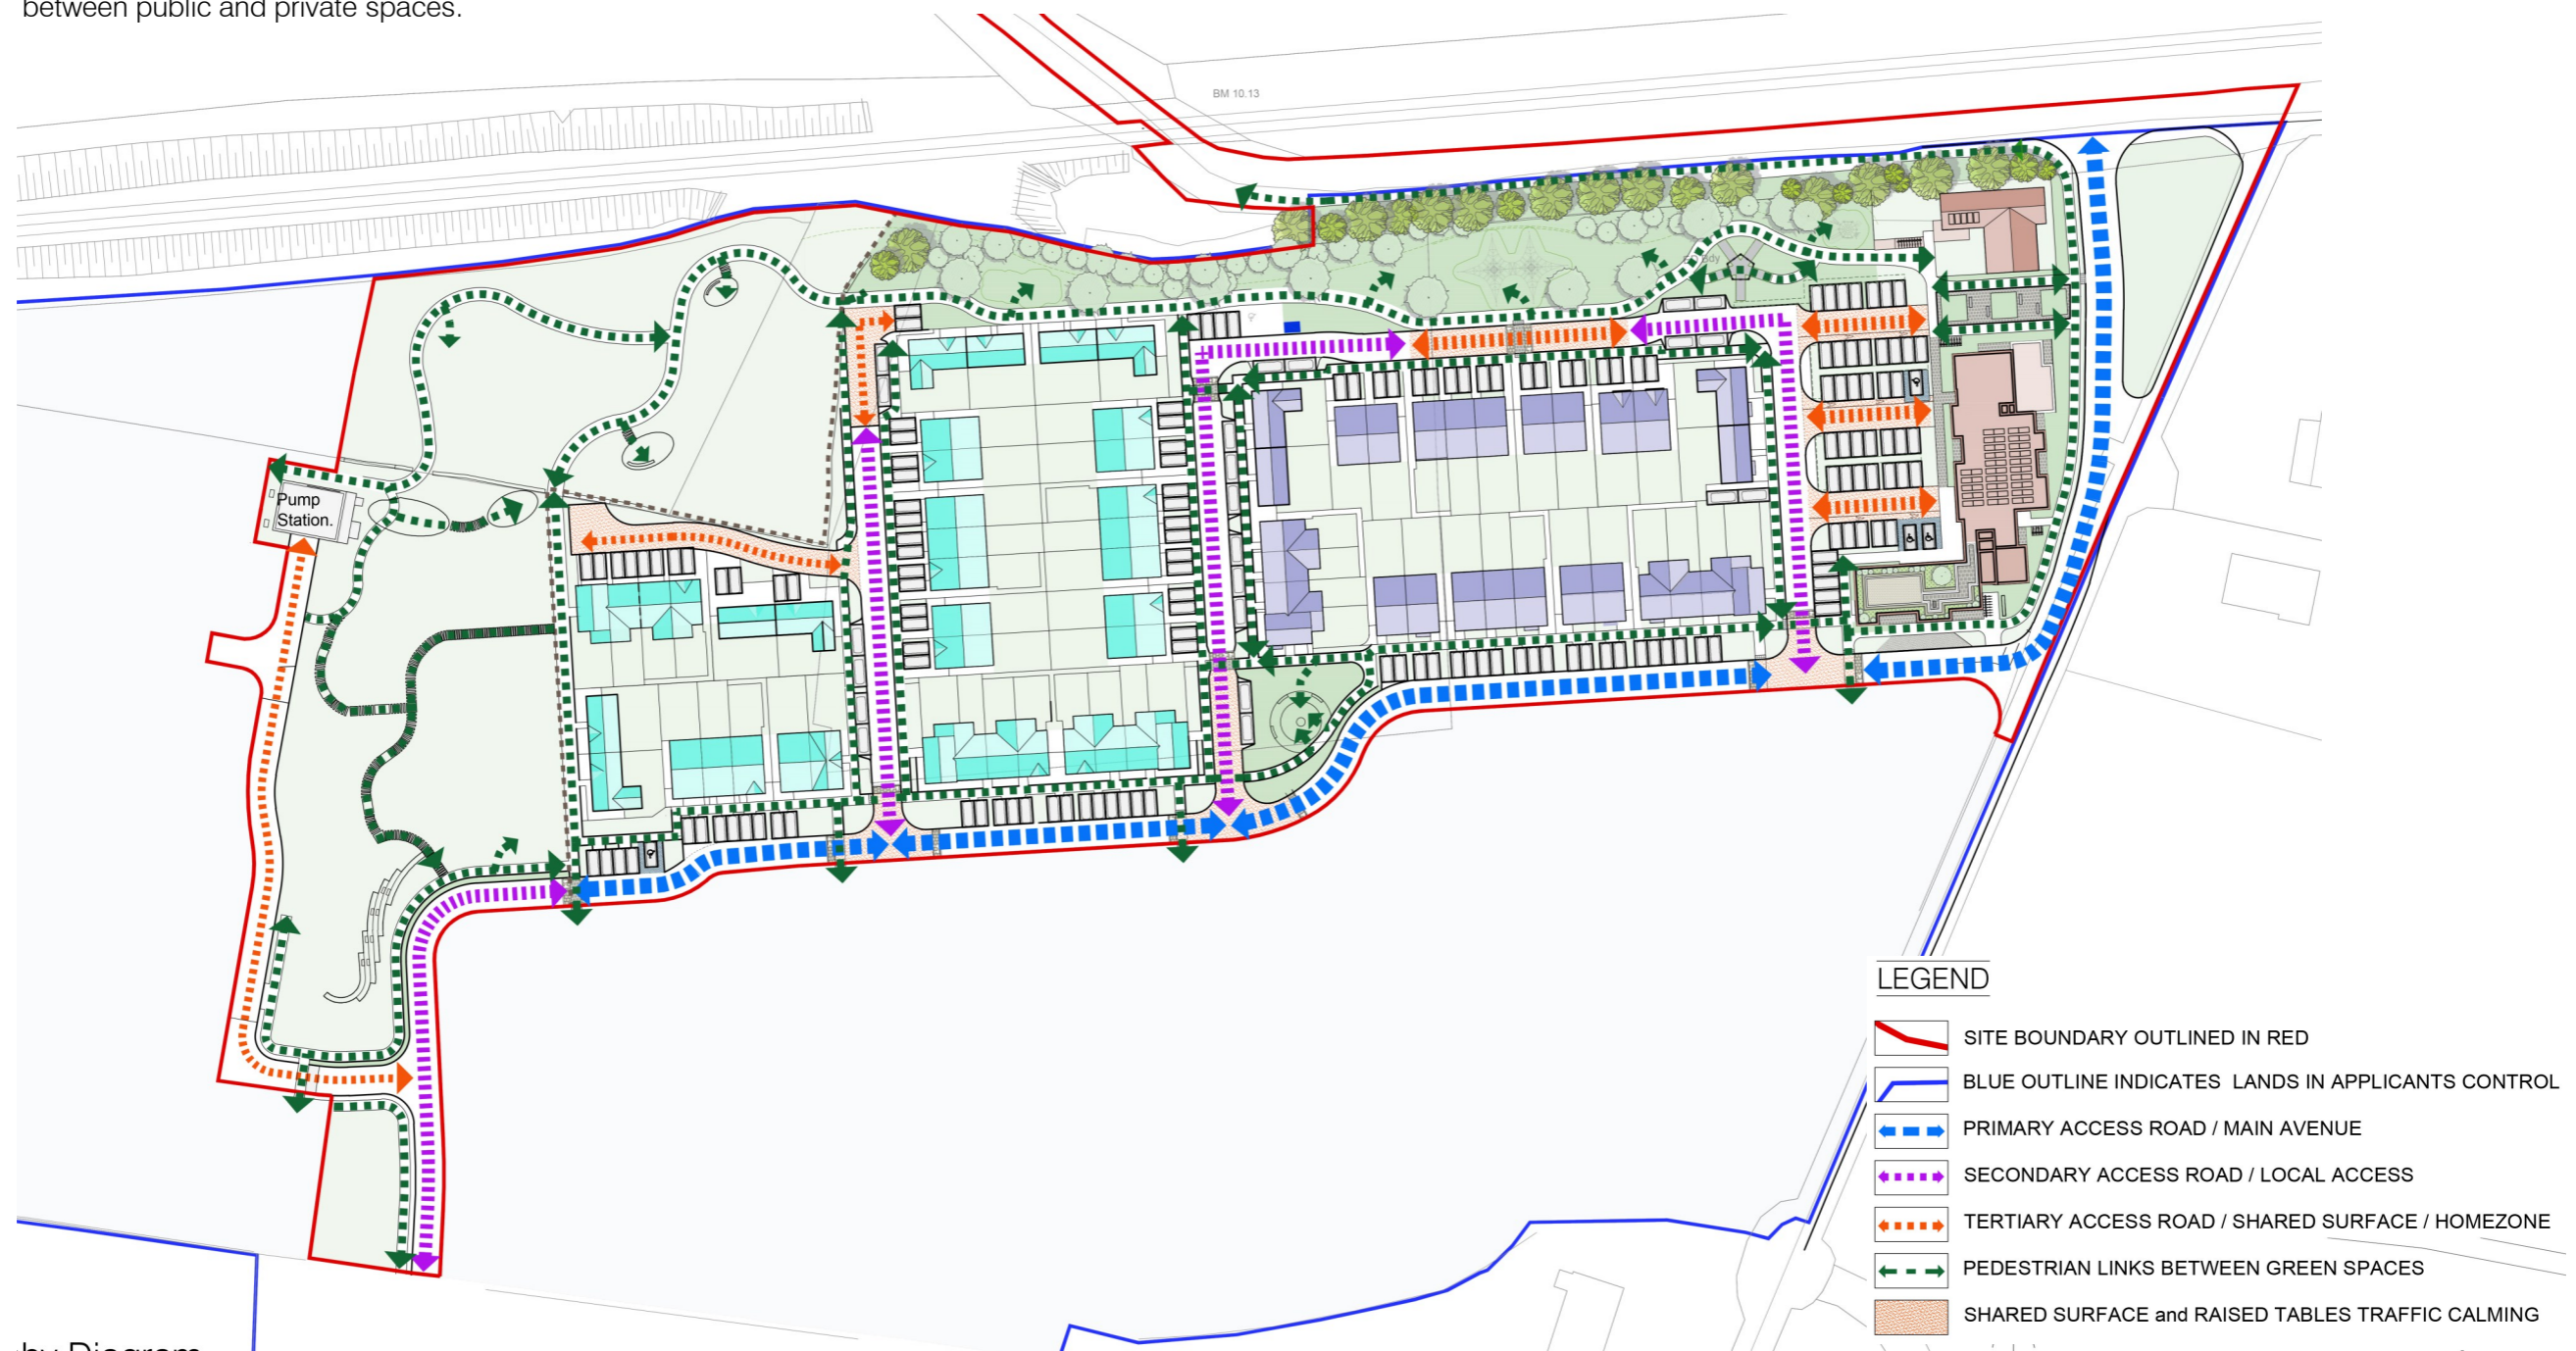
Site Connections showing raised tables and pedestrian linkages.
